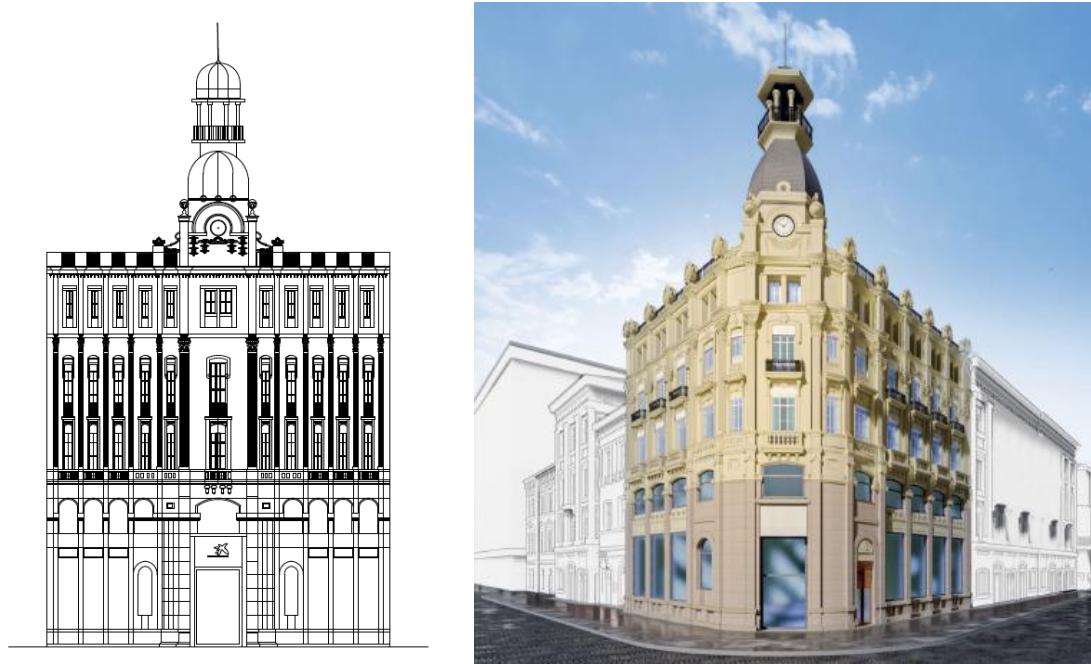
Façade plan and rendered. 3D view of the building (Own elaboration)
